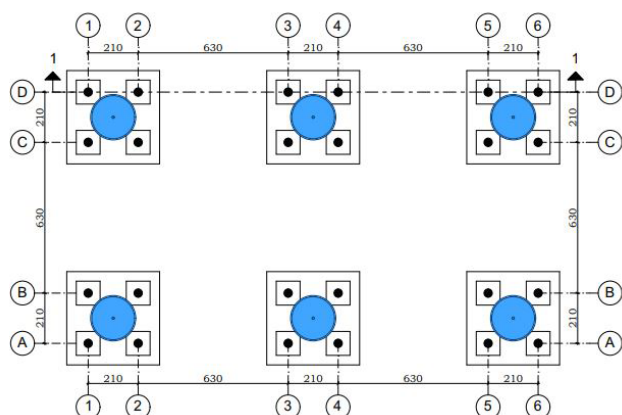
Modules without a basement. Plan of foundations. Six pieces of single foundations with four more steps for four columns in each single element
